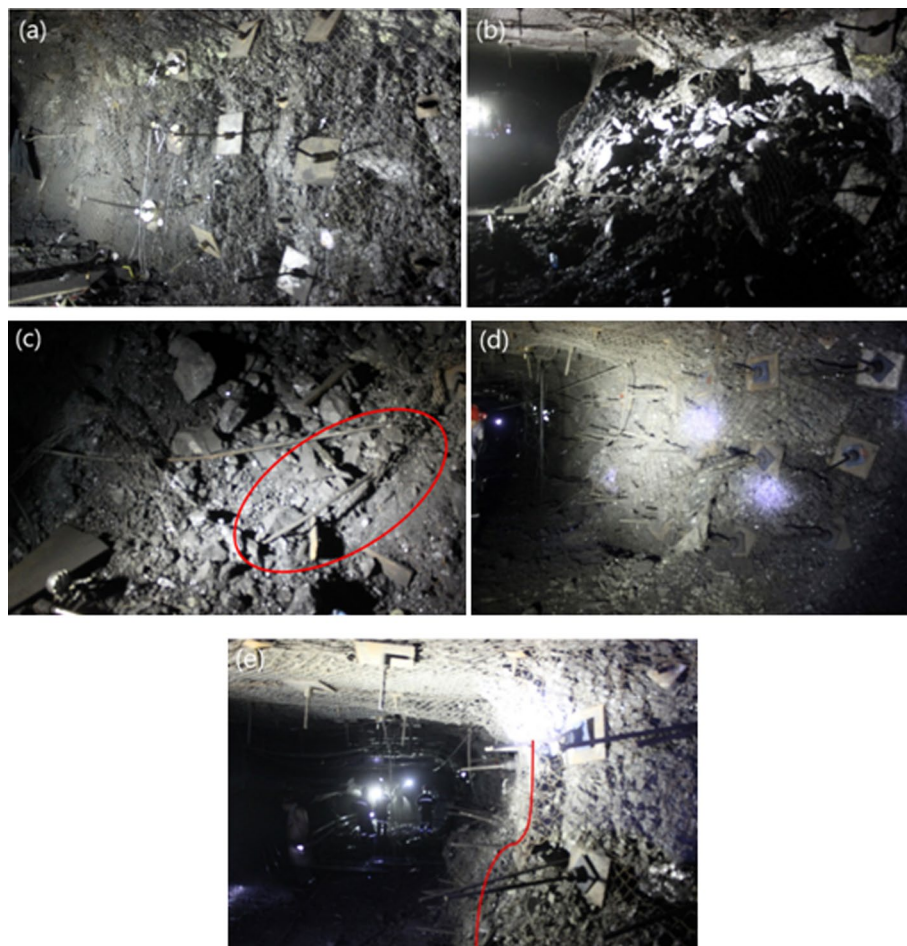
Supporting effects of the traditional and CRLD cables: a sidewall supported by traditional cables before the blasting; b sidewall supported by traditional cables after the blasting; c traditional cable pulled out due to the blasting; d sidewall supported by CRLD cables before the blasting, and e sidewall supported by CRLD cables after the blasting
